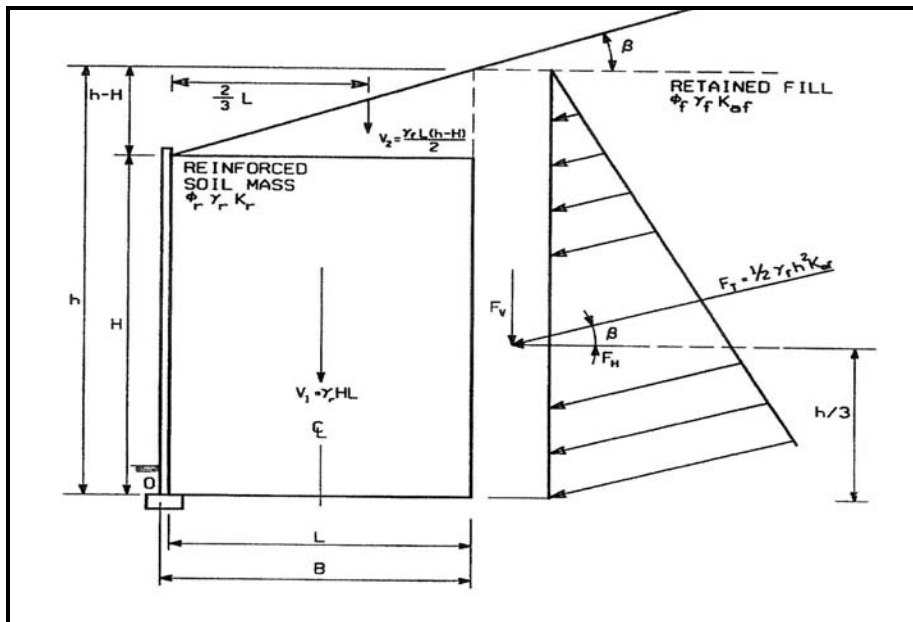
, MSE Wall Earth Pressure for Sloping Backfill (Mechanically Stabilized Earth walls and Reinforced Soil Slopes Design & Construction Guidelines – March 2001)
